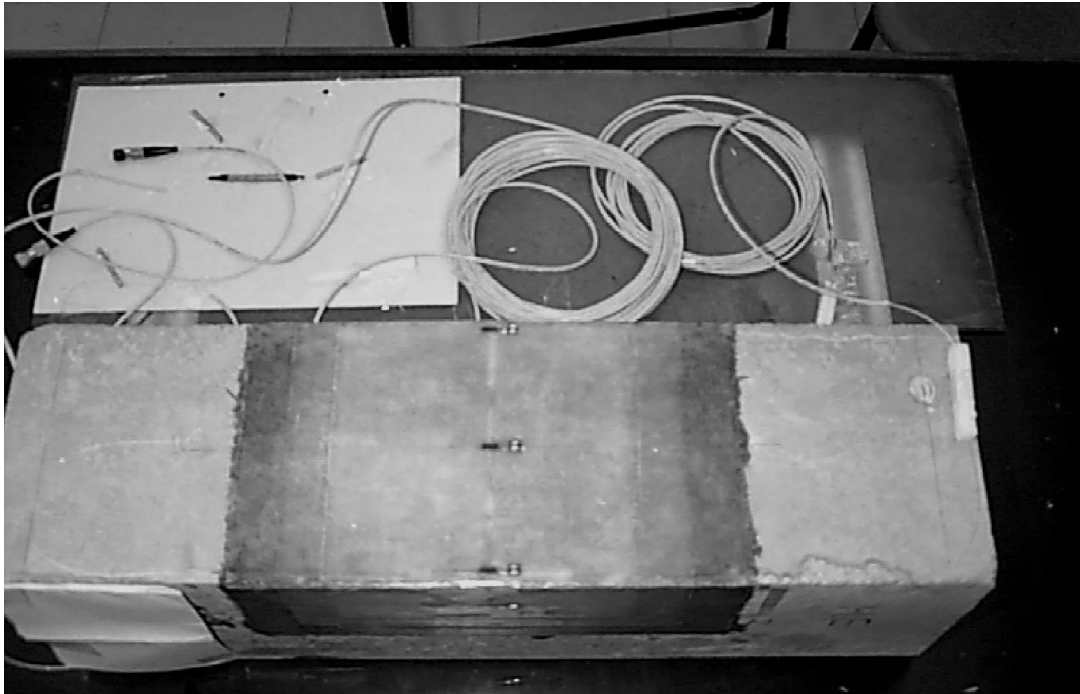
Photography of the composite-bonded concrete beam for strain measurement.
